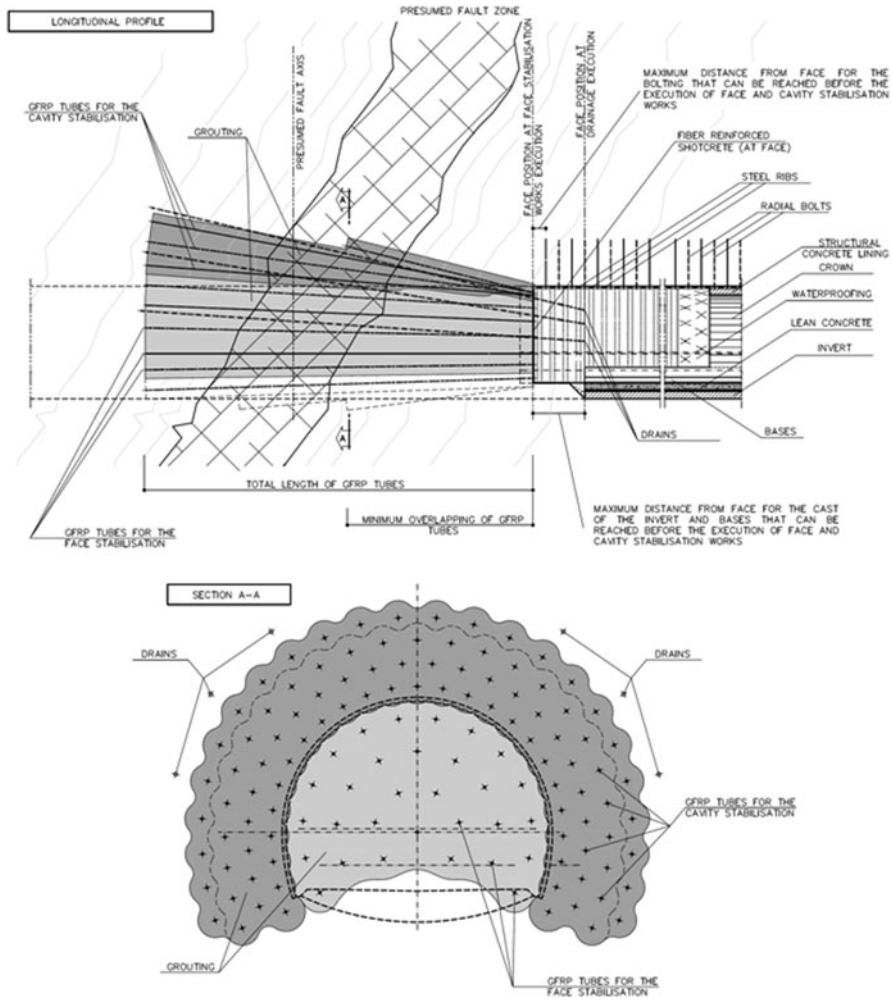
Injections while advancing to cross a fault (*longitudinal profile, cross section*)
